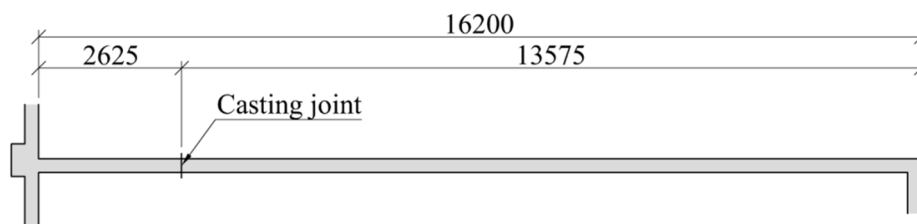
Longitudinal section of wall 1 in object A and location of casting joint
